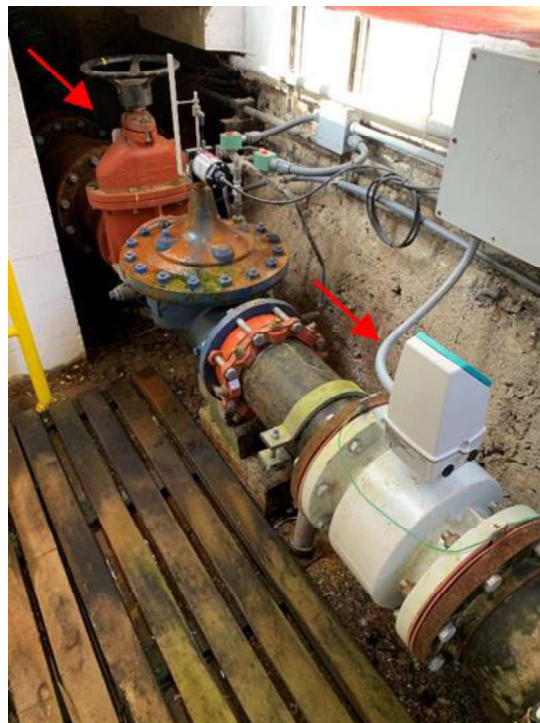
Piping, Valves and Flowmeter not Braced
